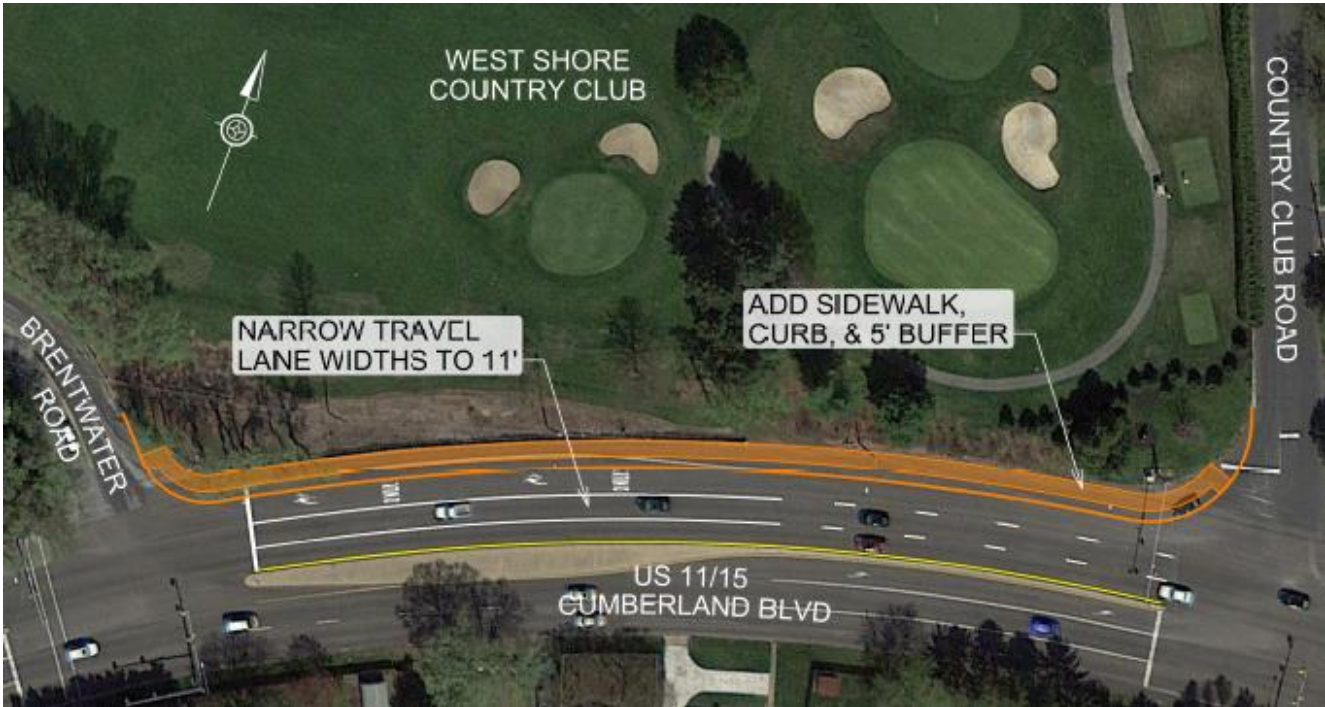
Proposed sidewalk installation, Cumberland Boulevard southbound between Country Club Road and Brentwater Road
